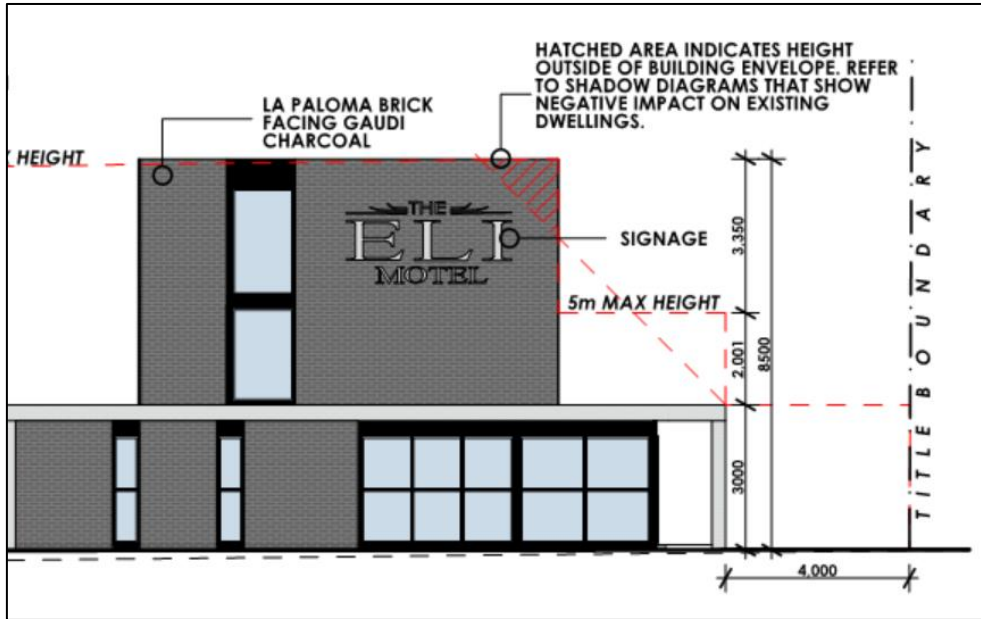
northern elevation showing western building with area outside building envelope shown hatched in red
